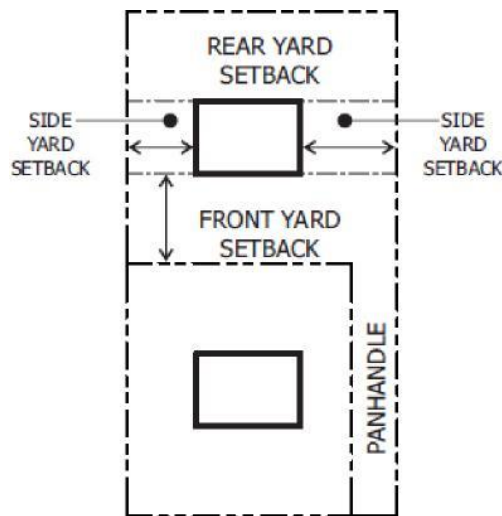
H: Yard and front yard setback locations on a flag or panhandle lot.
